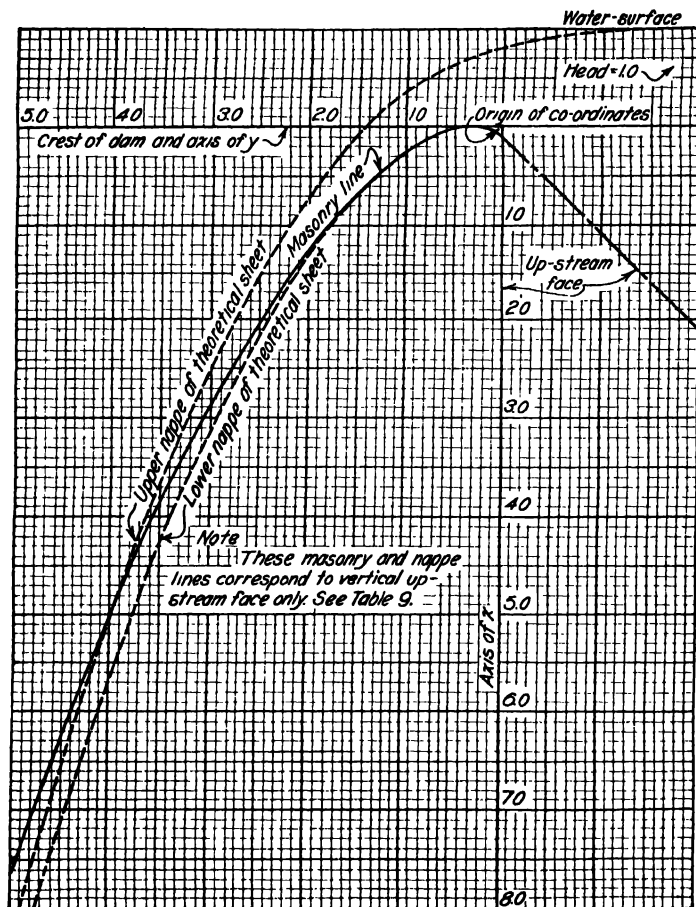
Recommended shape of crest and downstream face for spillway dams.
